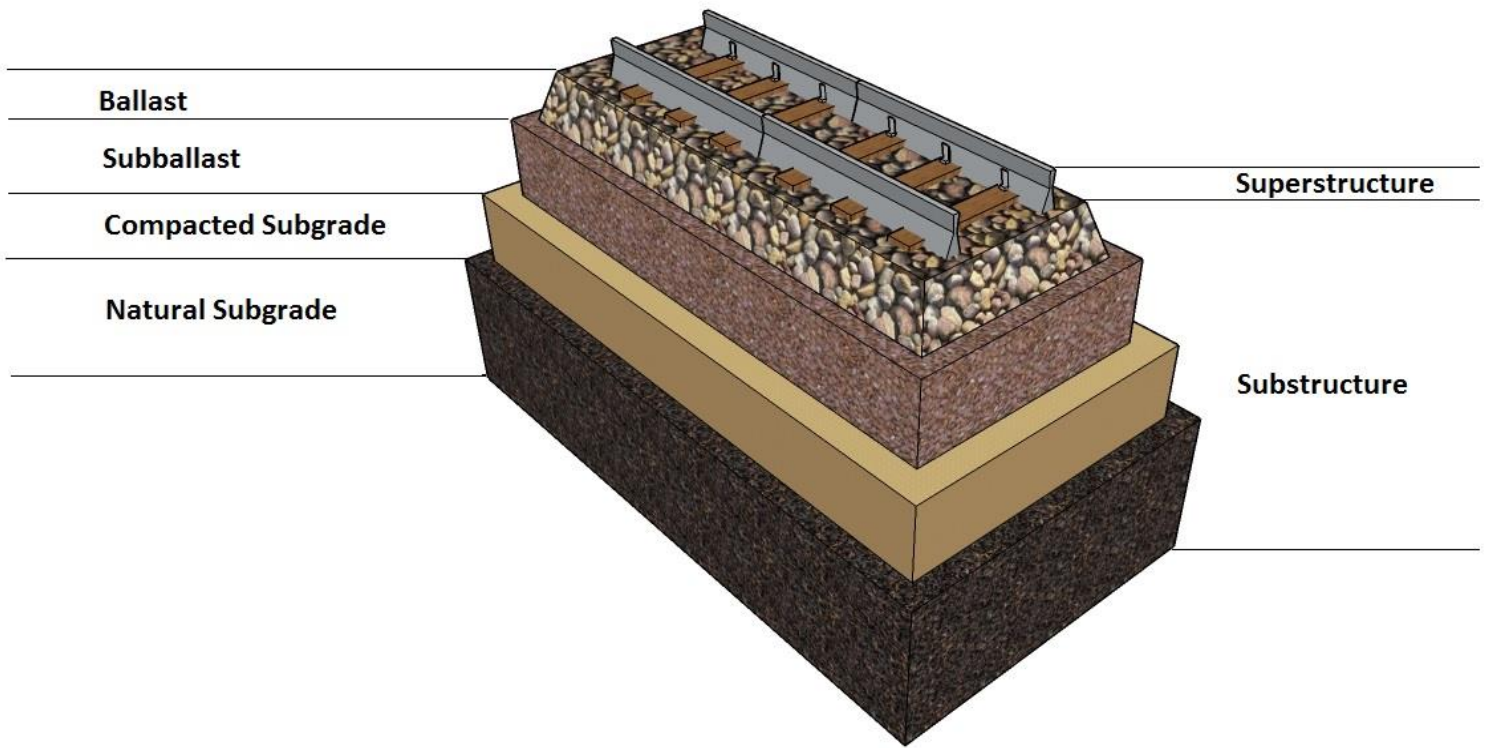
Typical Components of Superstructure and Substructure in a Railway Track
